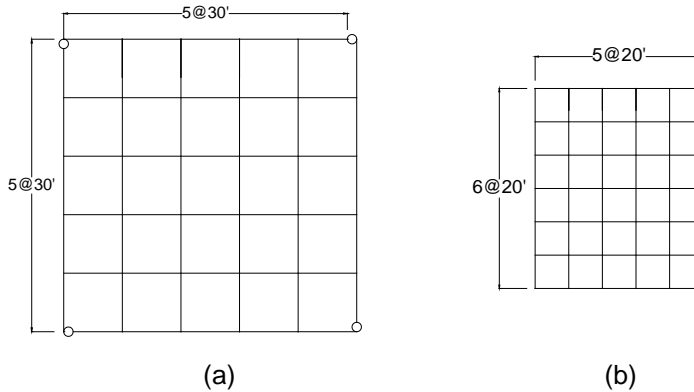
Floor plans showing layout of MRFs for LA model buildings (a) 9-story and (b) 20-story
